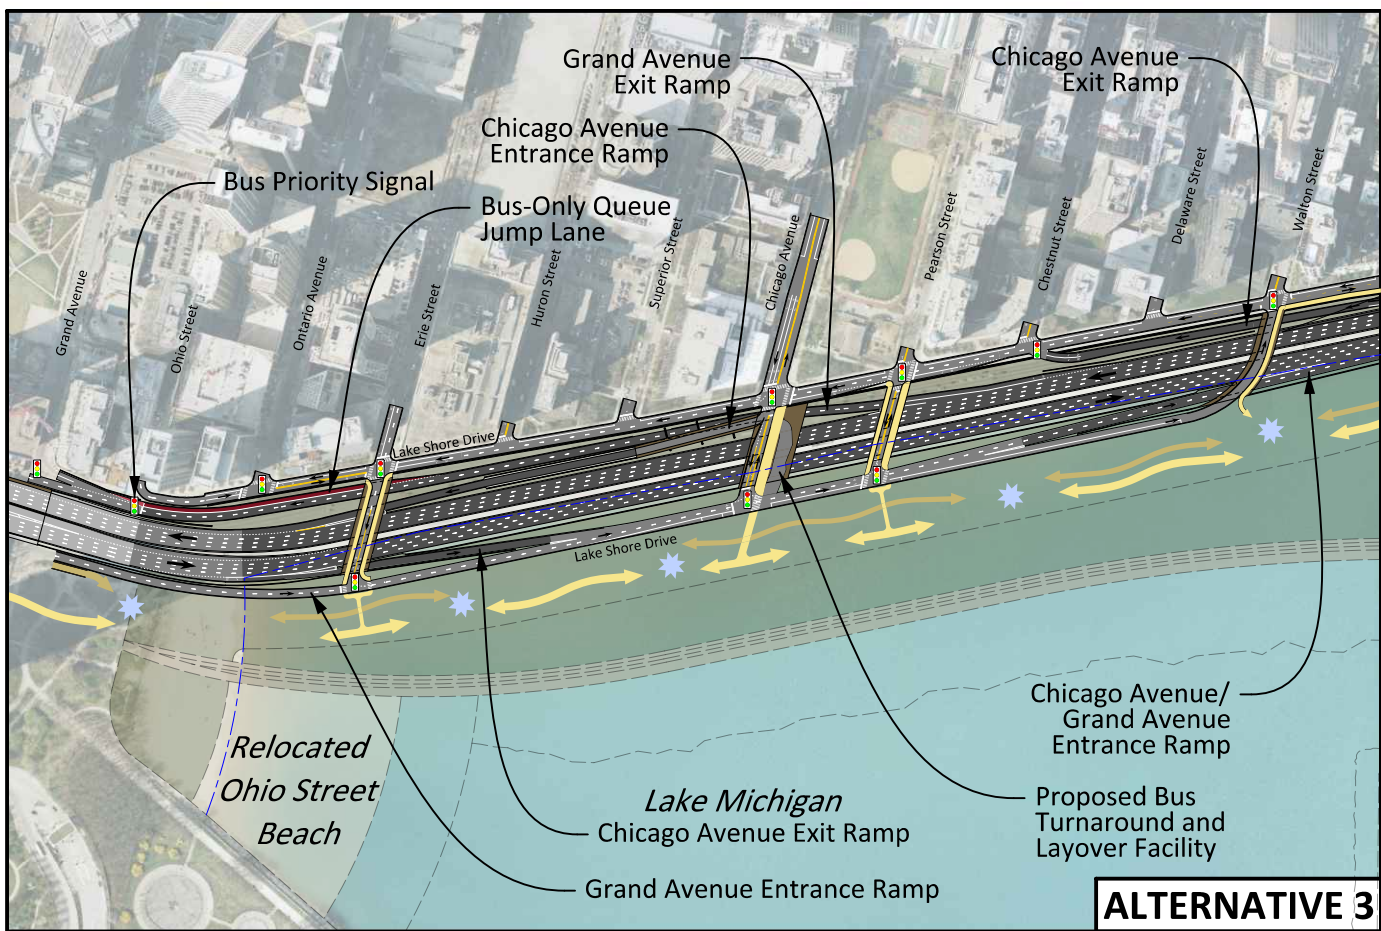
Chicago Avenue Junction Alternatives
